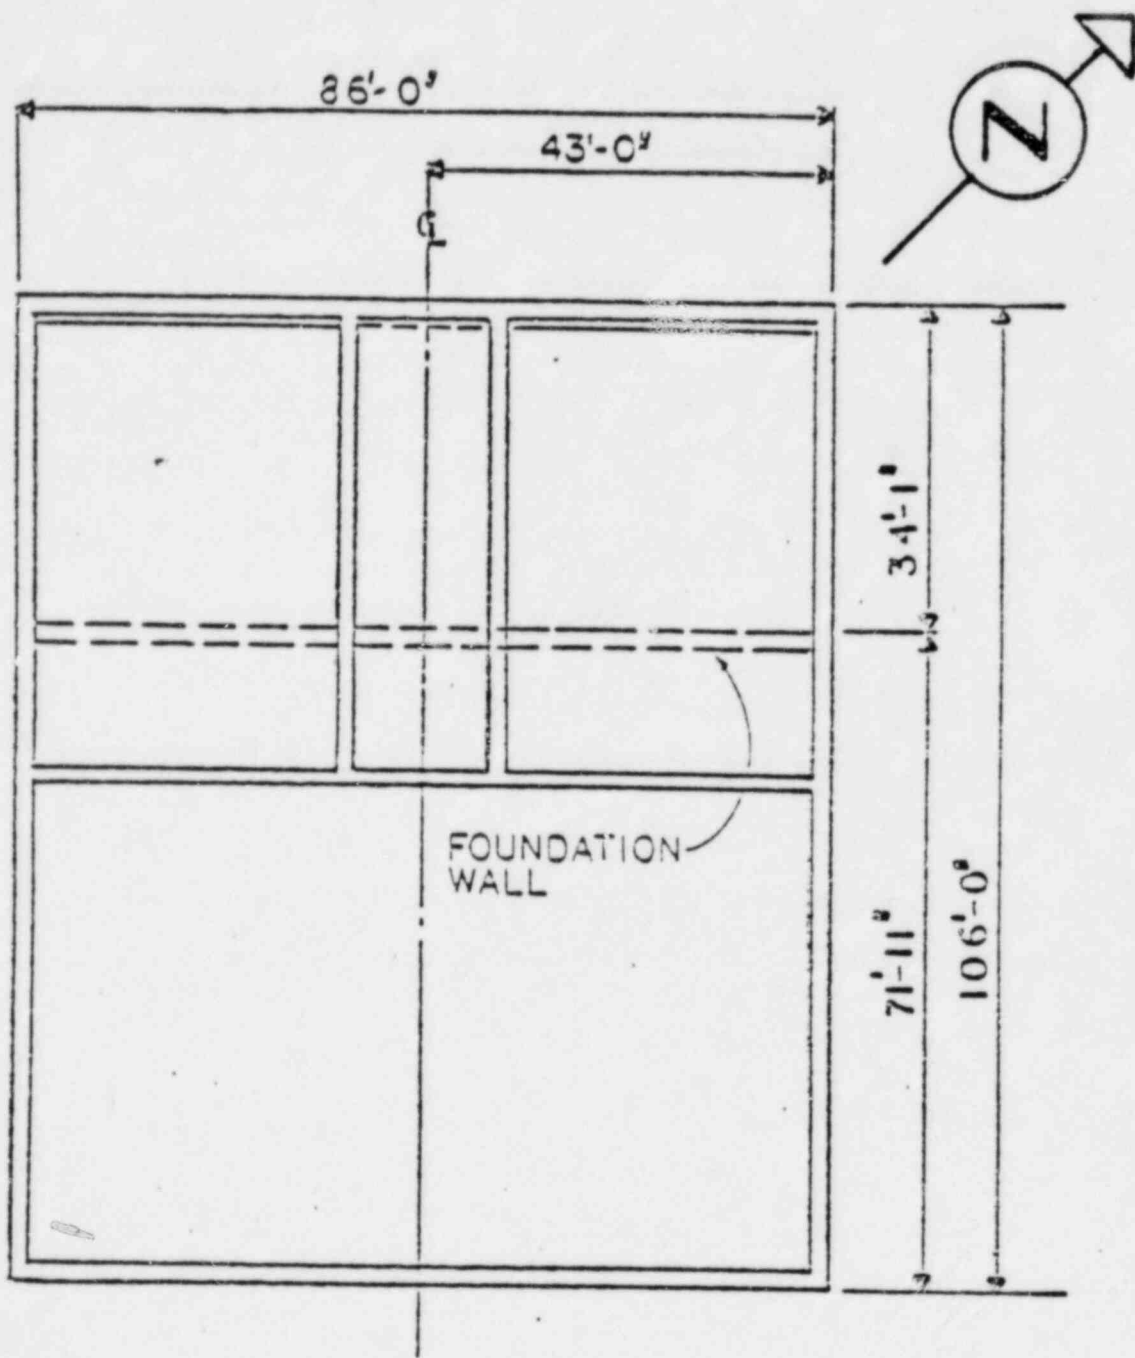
Service Water Pump Structure Plan at Elevation 634'-6"
